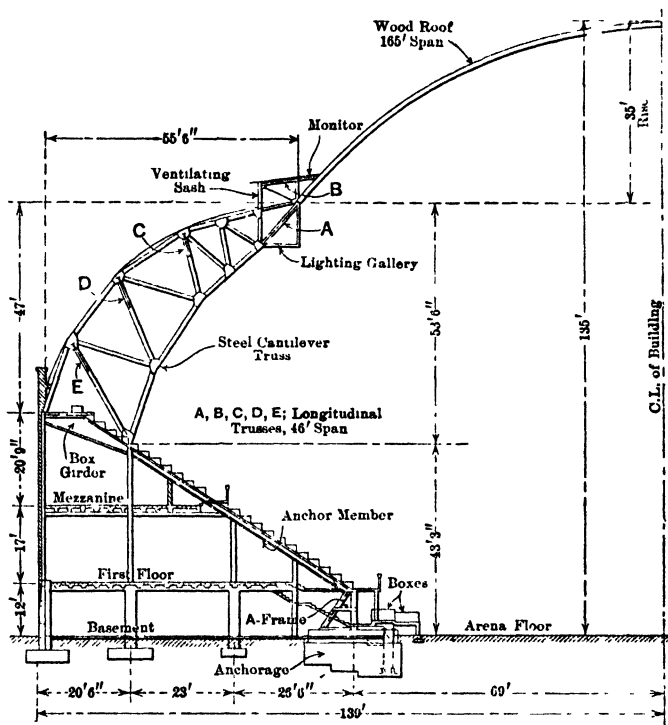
Steel Cantilever Trusses Supporting Lamella Arch Span. Arena of National Exhibition Company's Coliseum, St. Louis, Mo.
